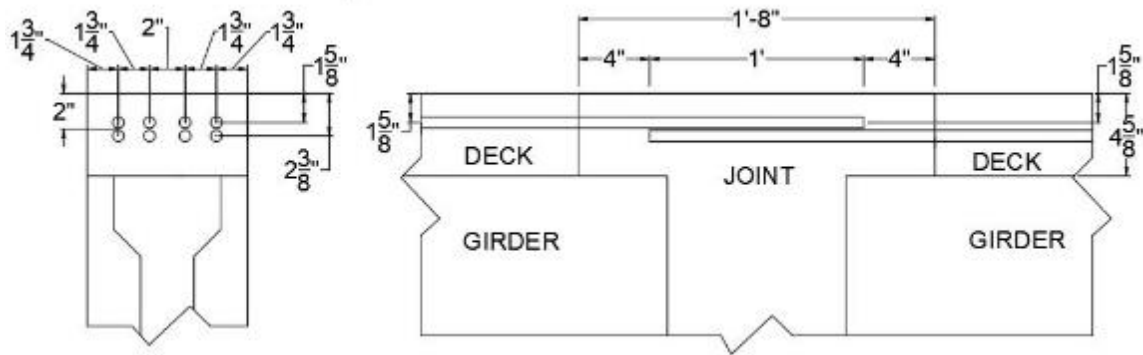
Newly constructed continuity joint mild steel detail for negative moment
